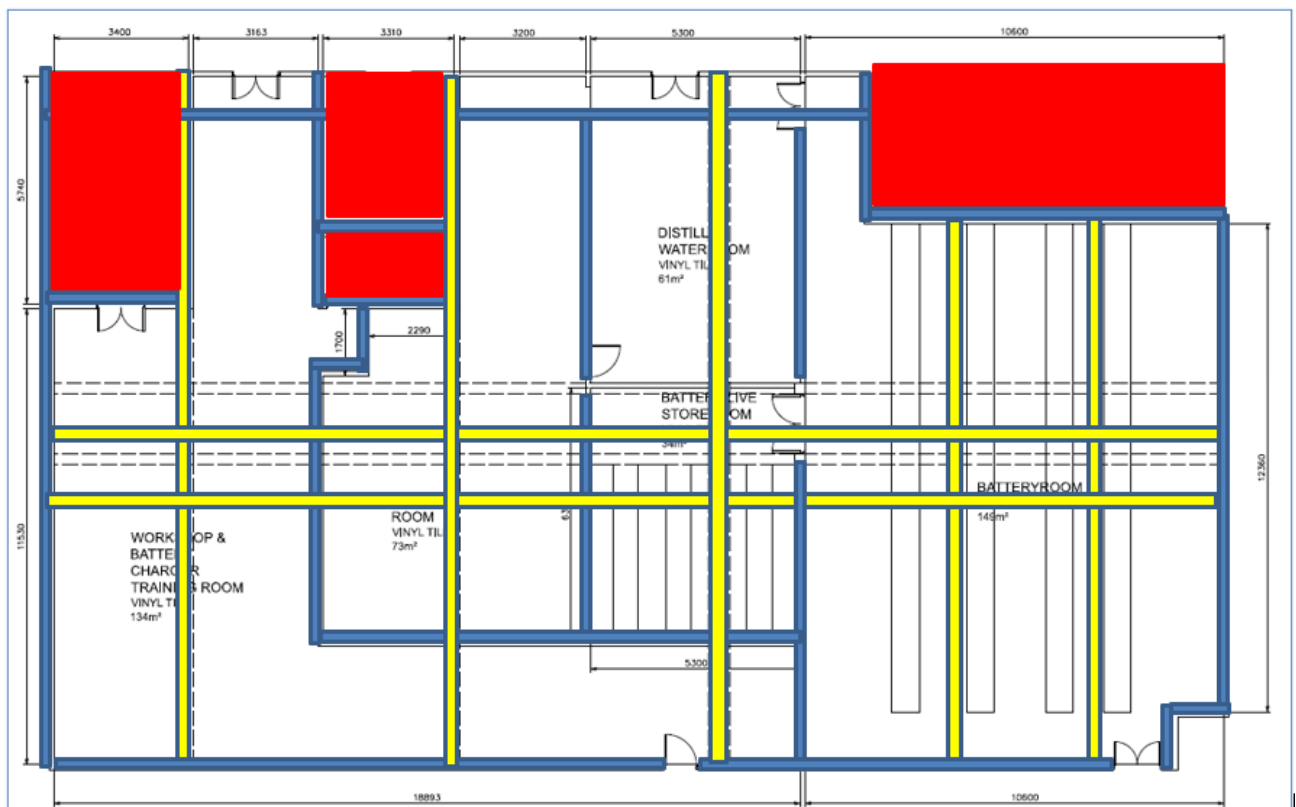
DC Workshop, Battery Room, and other rooms – beams & walls forming pockets
